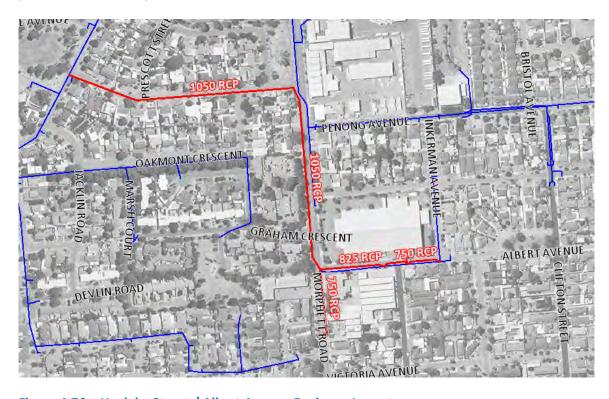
Hoylake Street / Albert Avenue Drainage Layout
